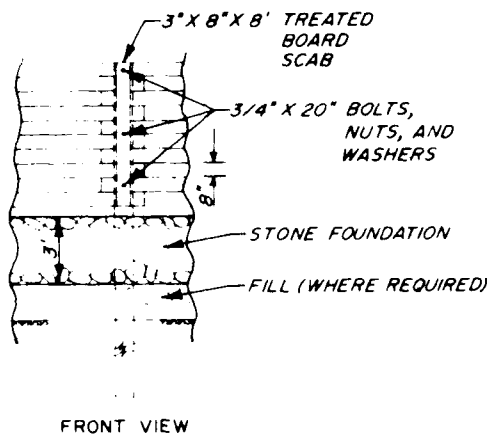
Boards attached to pilings with bolts (Source: Bank Stabilization, Batupan Bogue, Drawing No. 4, LMK, 1977.)
